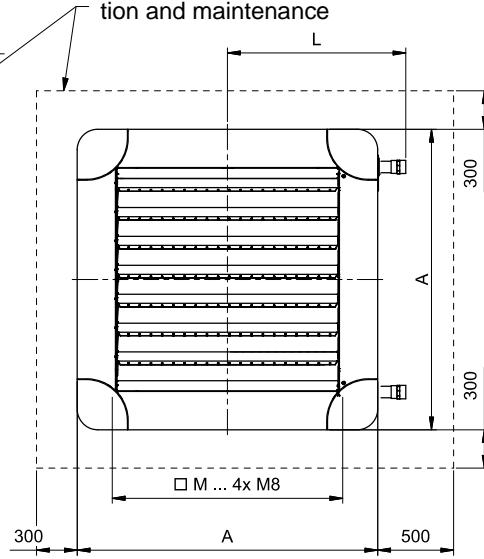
Dimension of unit heater and arrangement of heat exchanger connection fittings
